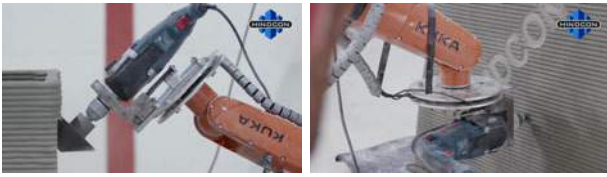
Hindcon: milling freshly 3D printed mortar to improve tolerances change the finish.
